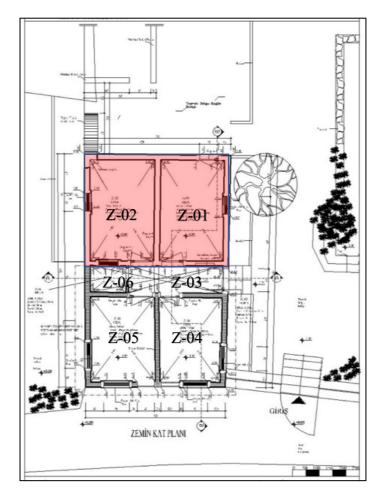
Ground Floor Plan (Tanrıverdi, 2011)
